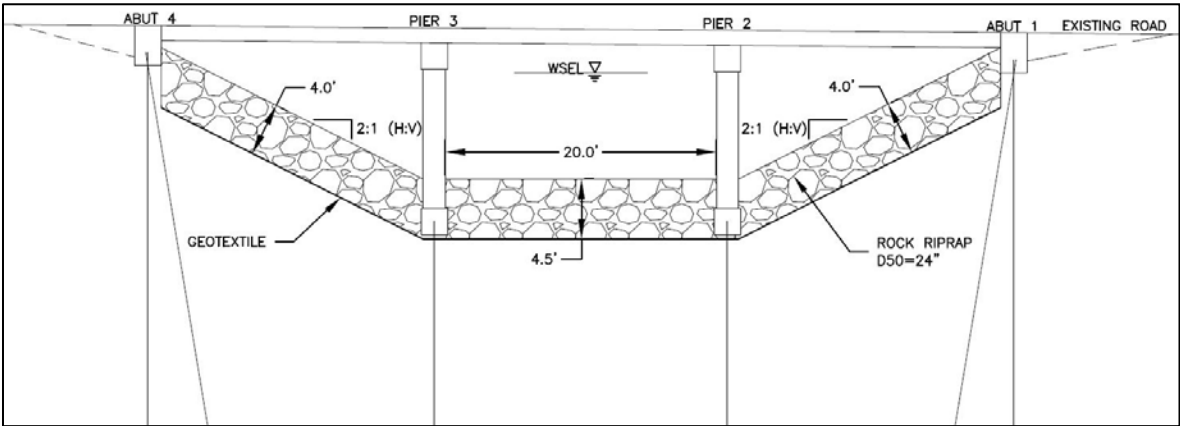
Cross-sectional view of Bridge H-03-Z with recommended hydraulic scour countermeasures
